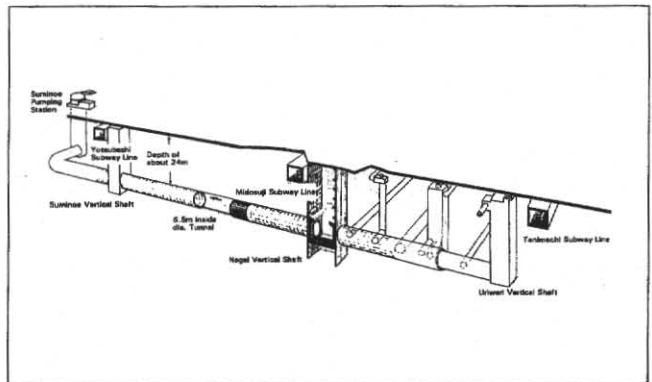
Typical Drainage Tunnel (Naniwa Grand Floodway, Osaka)
